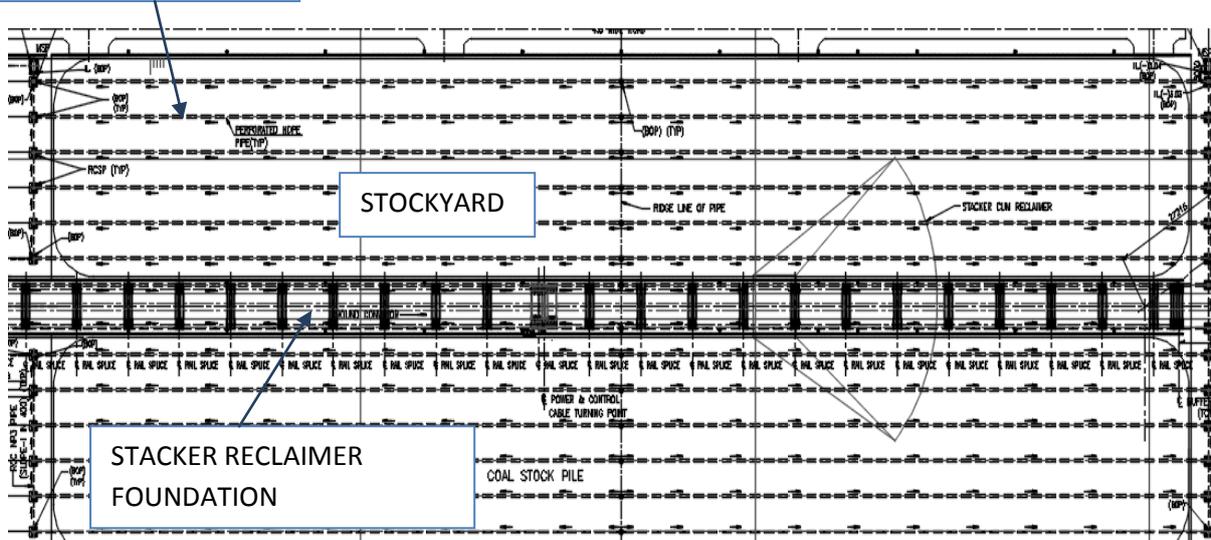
Stacker Reclaimer Foundation Plan along with stockyard drainage
